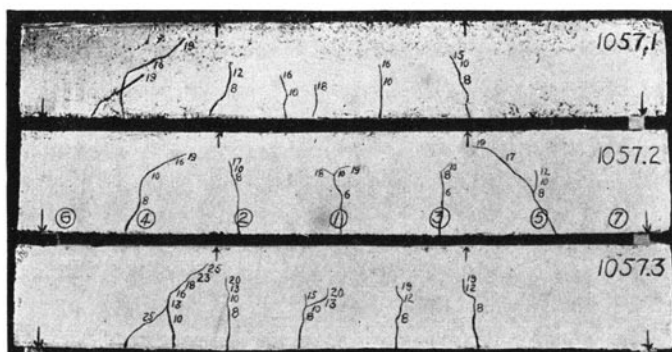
REINFORCED CONCRETE BEAMS AFTER TEST.
